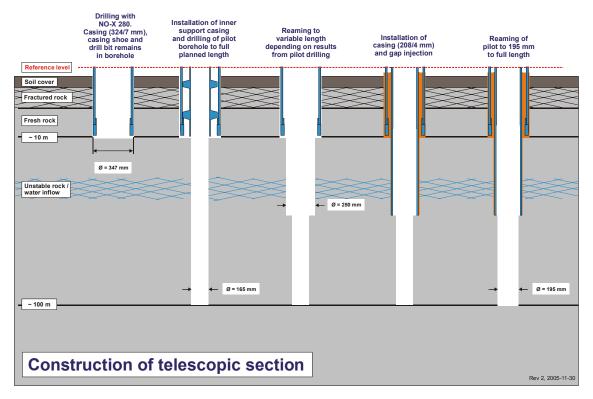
Construction of the telescopic section. The gap filling cement is introduced between the casing and the rock wall. The drill bit acts as a barrier so that cement does not enter the pilot hole.
